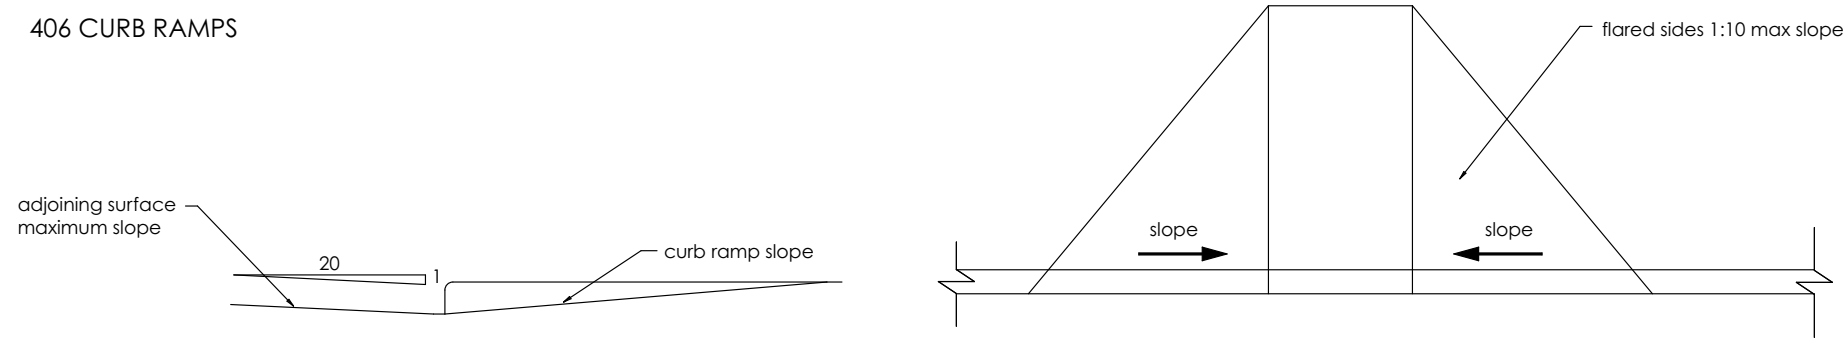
Counter Slope of Surfaces Adjacent to Curb Ramps
